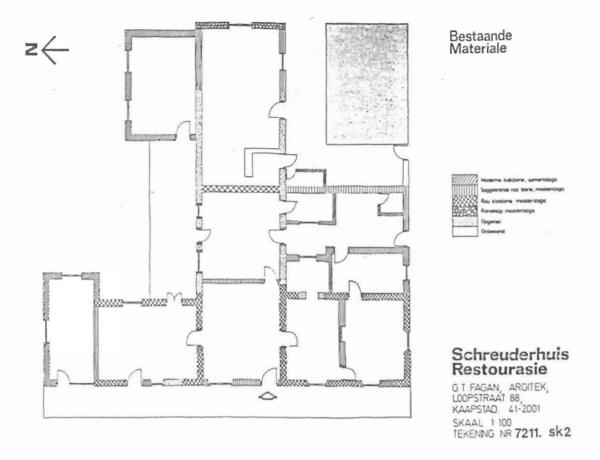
Site plan of Schreuderhuis after all plaster was stripped (similar to Fagan & Fagan 1975; SB Museum).
